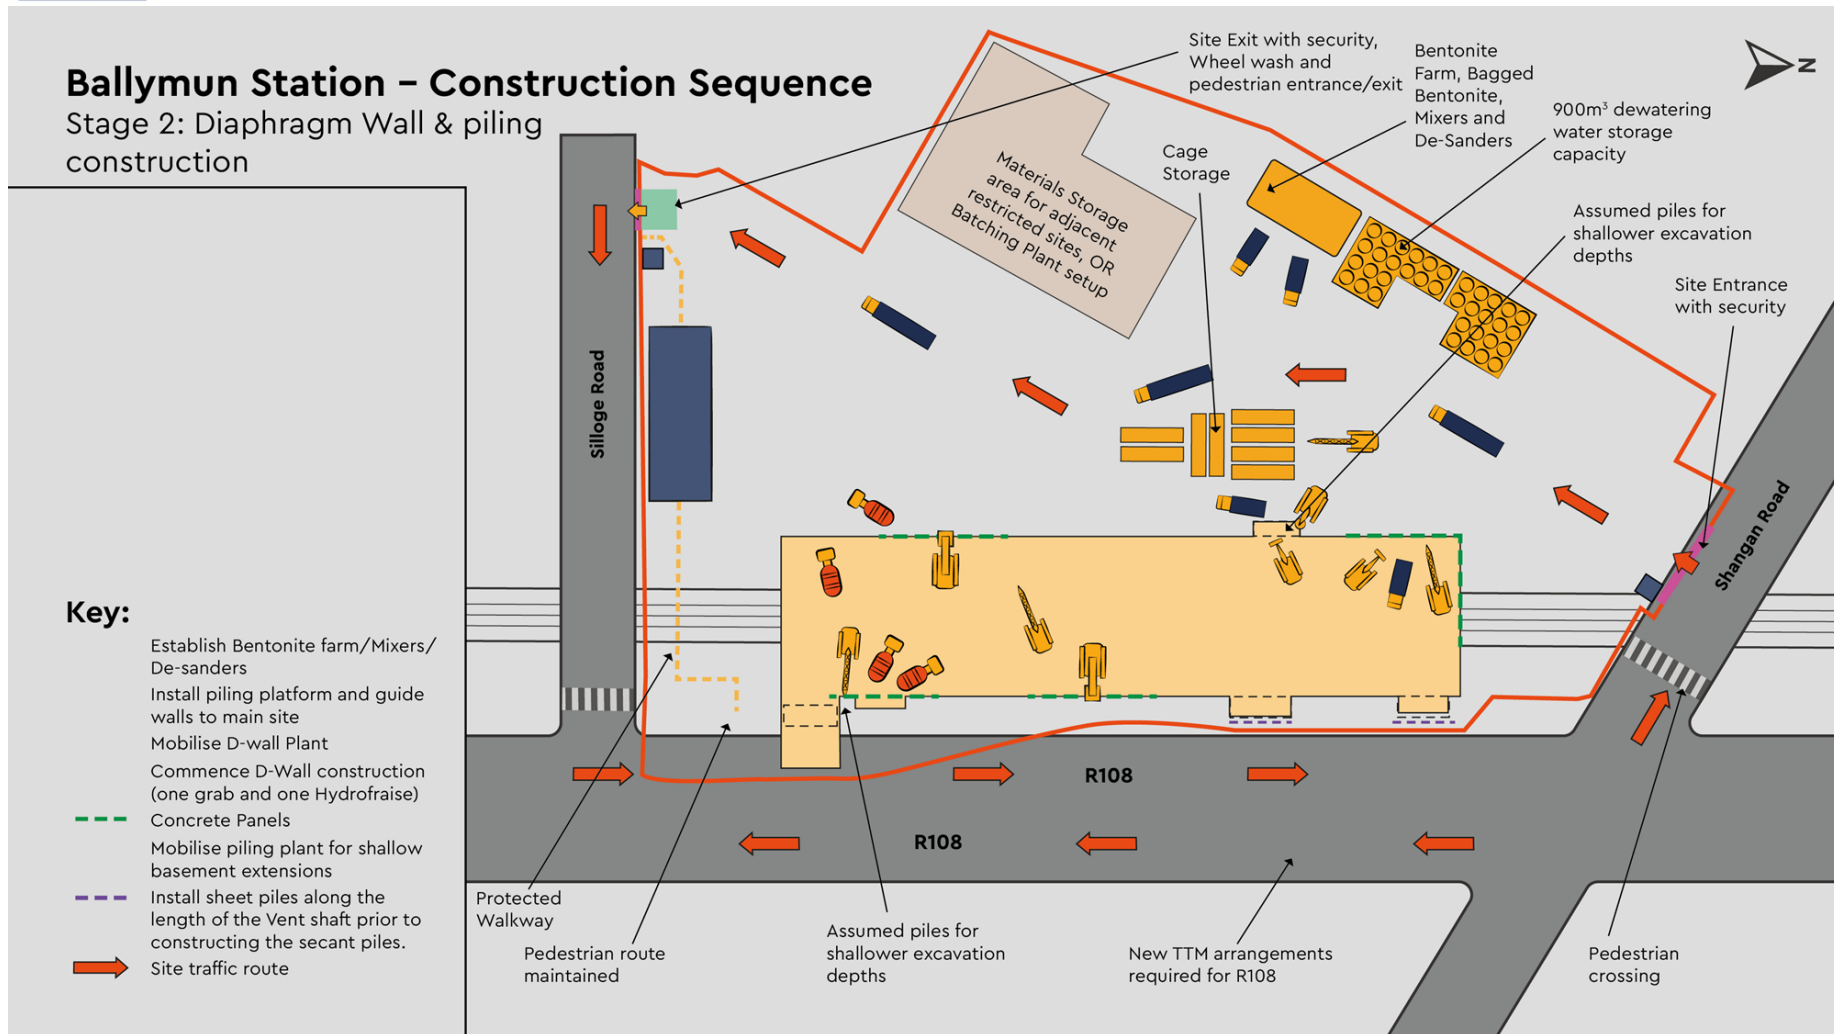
Ballymun Station Stage 2 – Diaphragm Wall and Piling Construction
